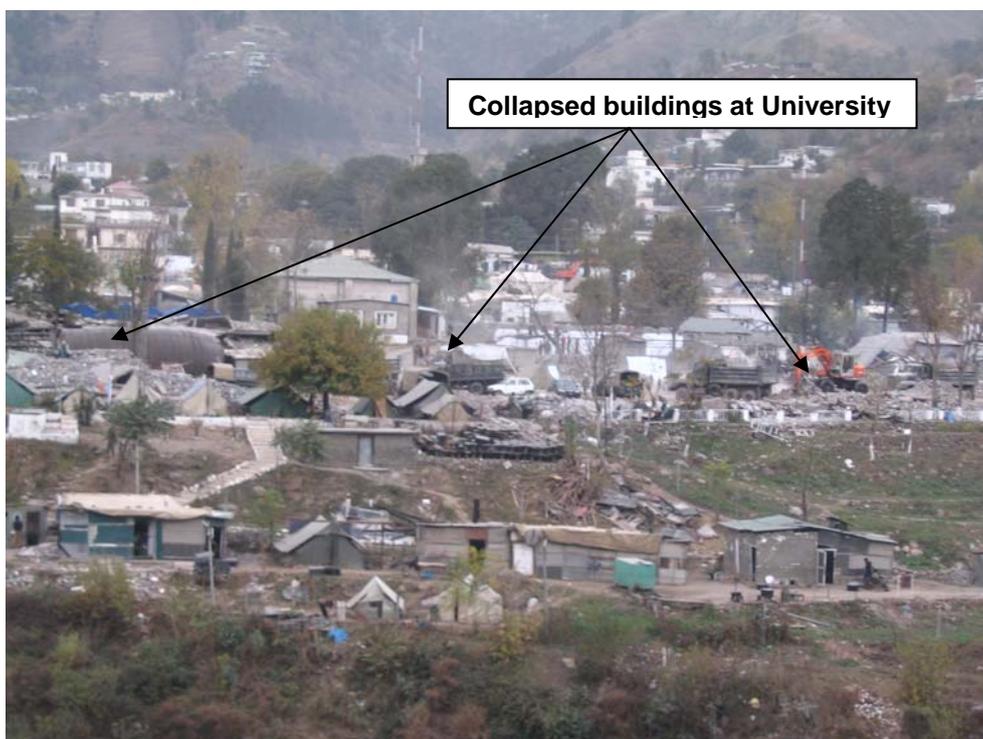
Collapsed concrete block URM buildings of the University of AJK, Muzaffarabad
